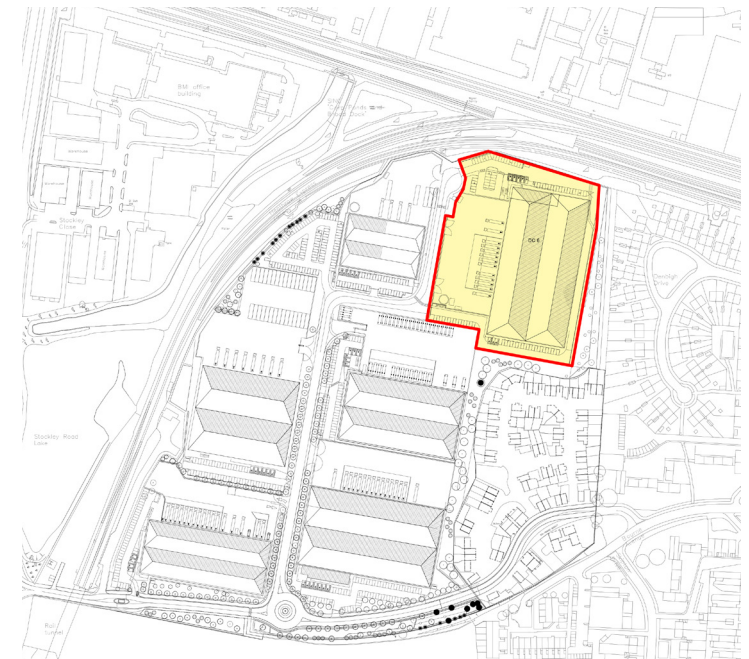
IMAGE ABOVE: EXISTING SITE PLAN SHOWING UNIT LOCALITY
